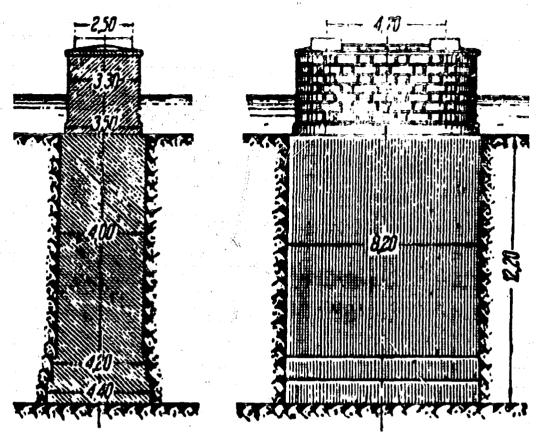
Center Pier of Bridge with 85-Mater Spans, Breeted by Freezing Method
